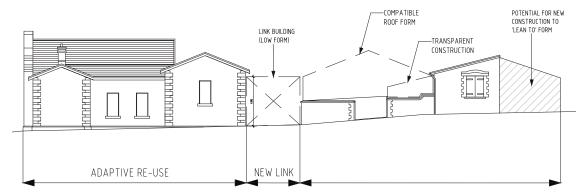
North elevations of Coach House & Stables showing possible adaptions and new link building.
